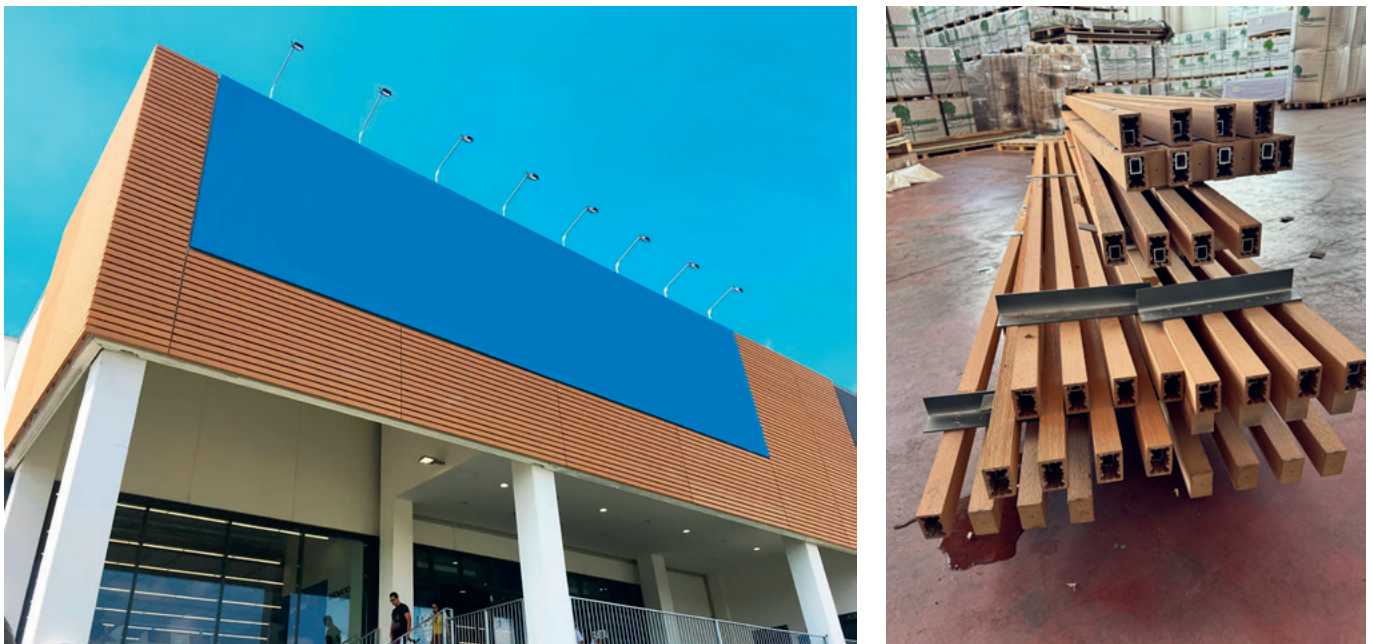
Left: store façade. Right: façade cladding systems disassembled and brought to the factory to be disassembled and shredded. © 2025, Iperwood®.
